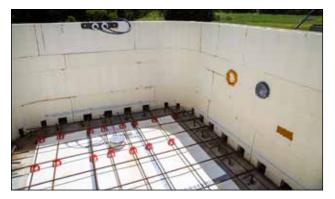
Pool lights sleeves installed and hydraulic lines for Fastlane System. Make sure to protect all sleeves and plumbing from concrete spillage during the pour. If placement errors are made, replace the foam and glue in place. Strap and reinforce as necessary before the pour.
